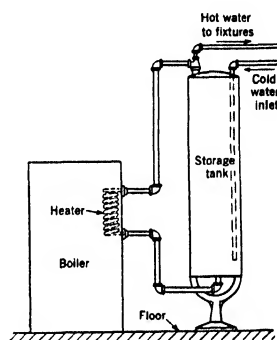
INDIRECT WATER HEATER PLACED IN BOILER
